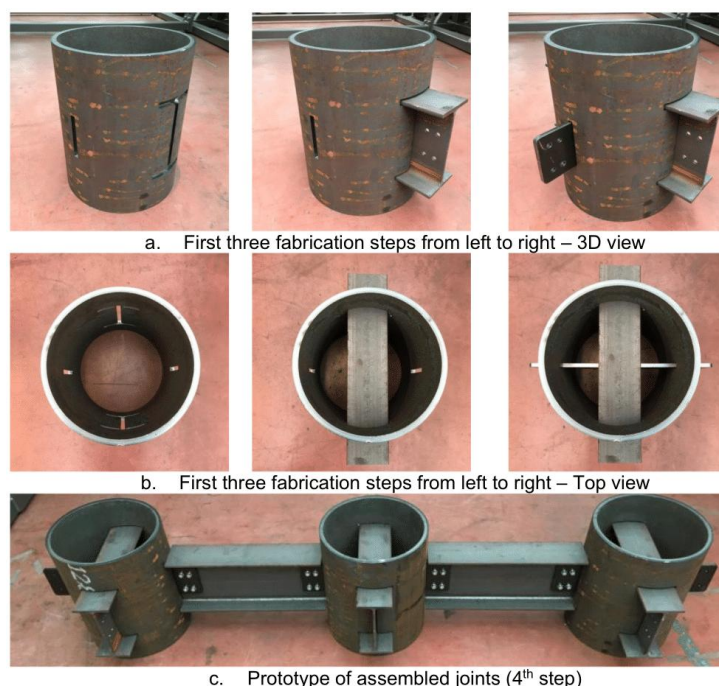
Prototype of assembled 4-way joints with passing-through beams and [6]
